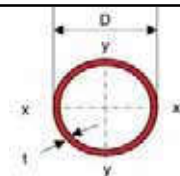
How to measure cross-sectional dimensions of hollow sections
